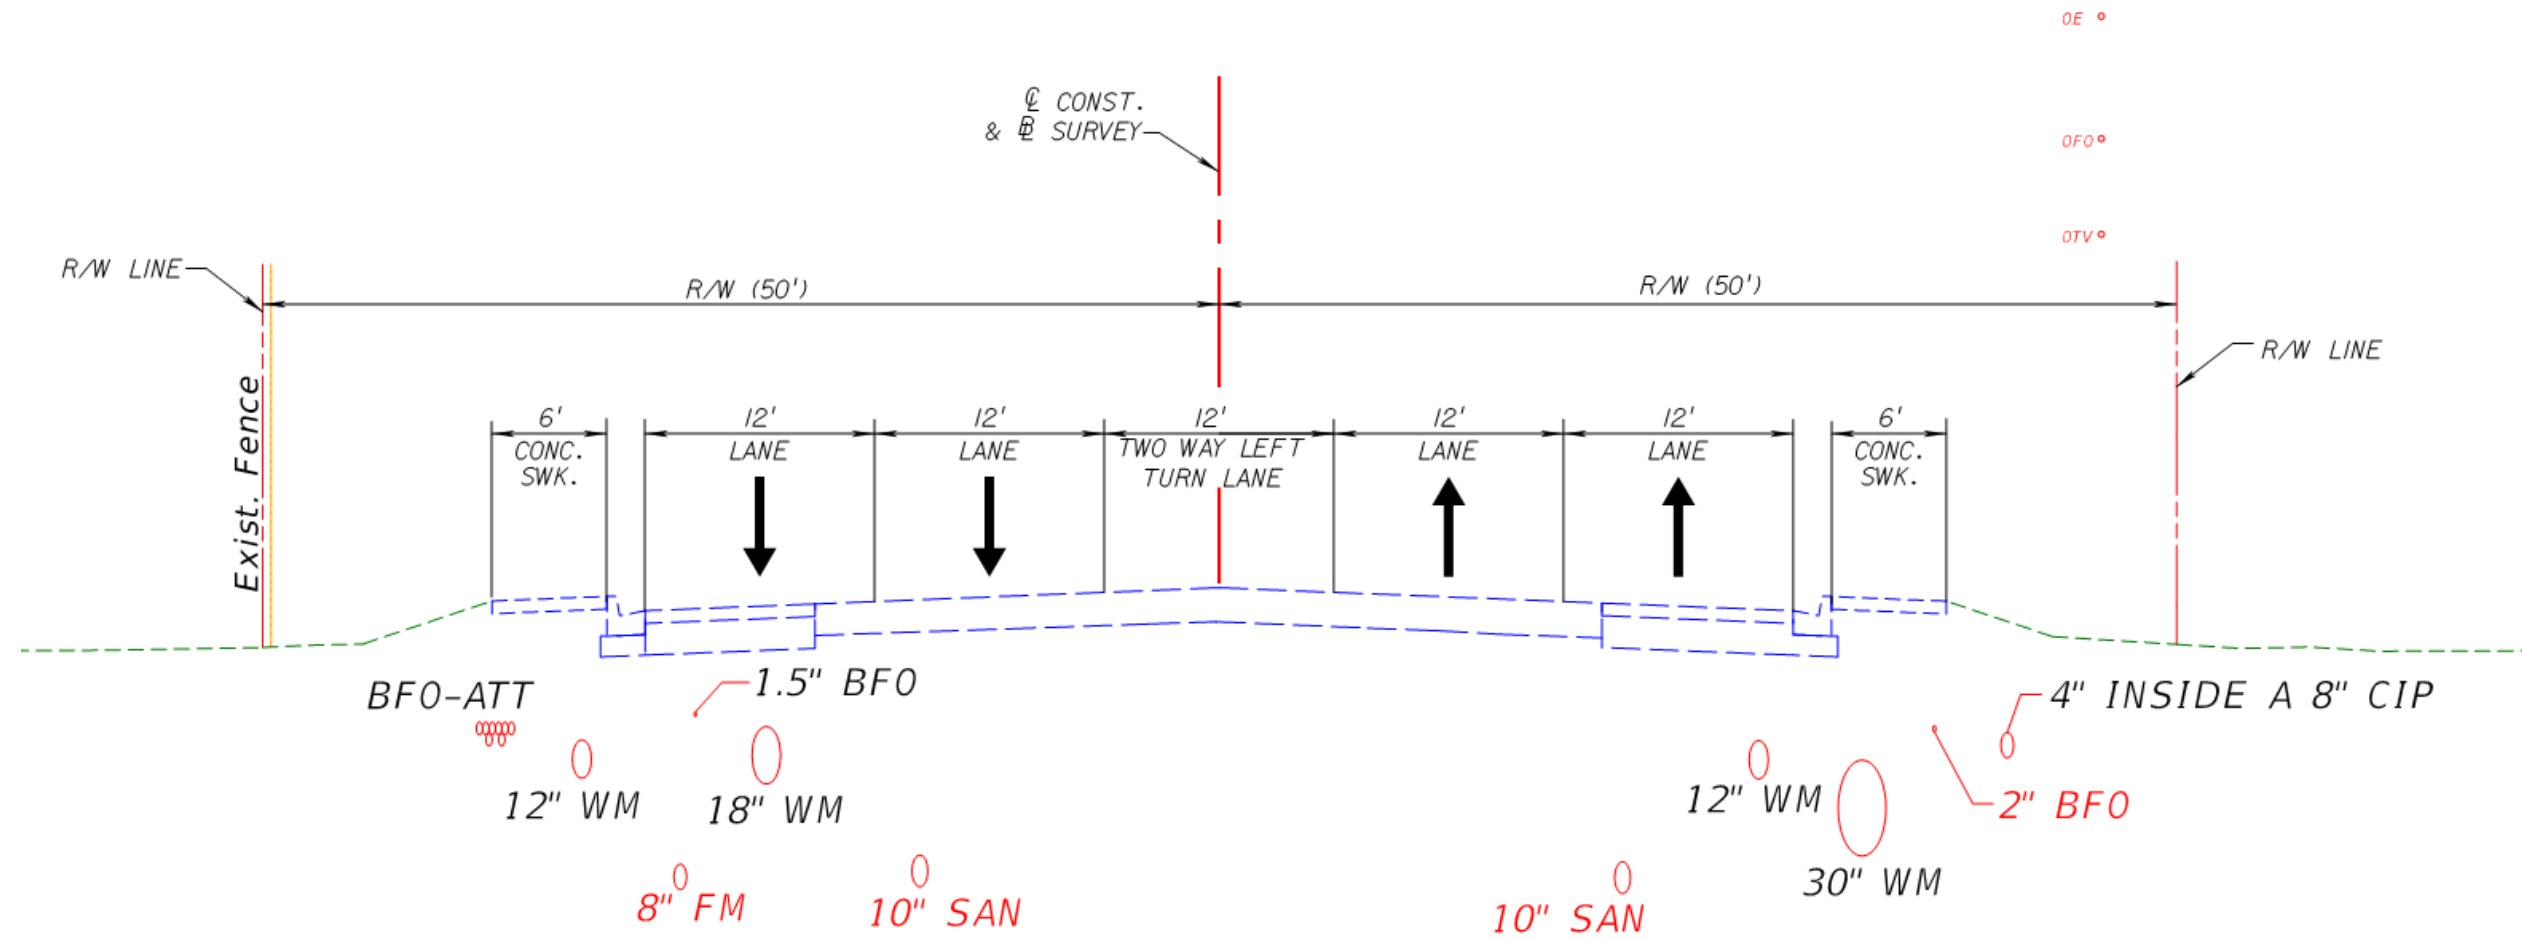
Location 2B (MM ±49.05) Existing Conditions Plan
